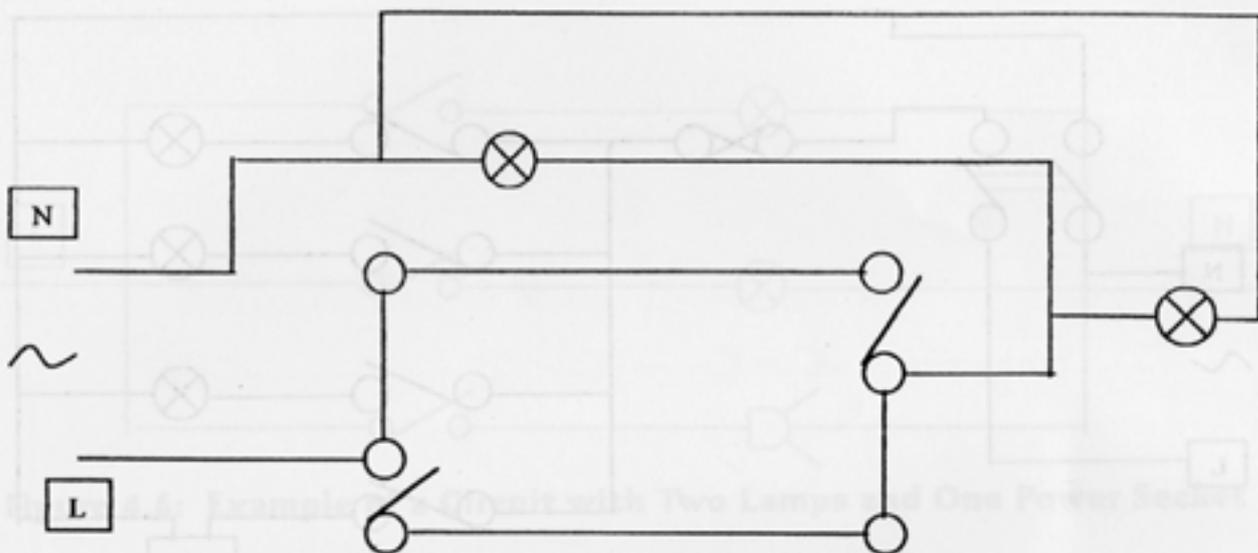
Staircase Lamp Wiring with Two Lamps and Two Two-way Switches
